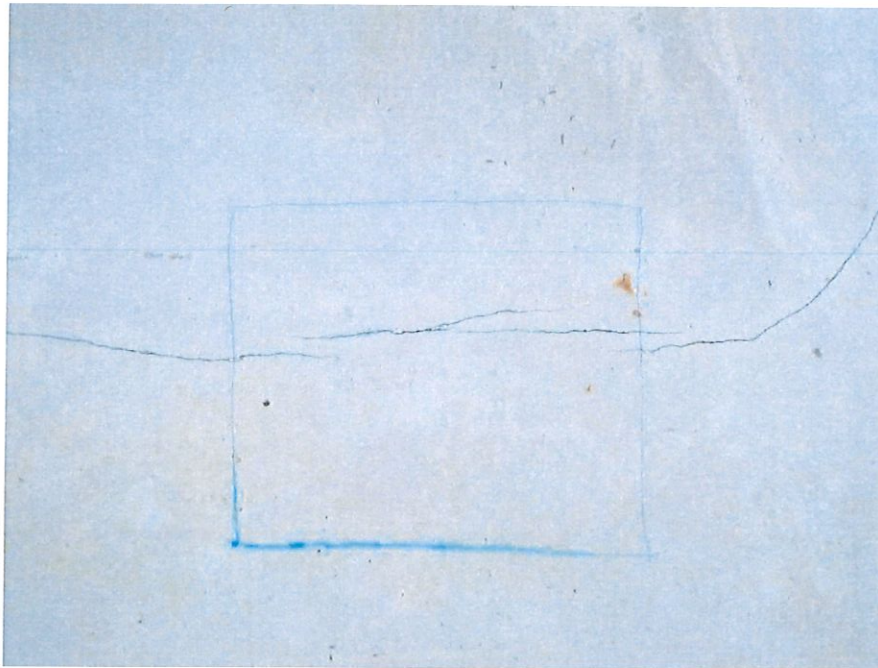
Corner Crack at Pool Basin Wall Intersection
